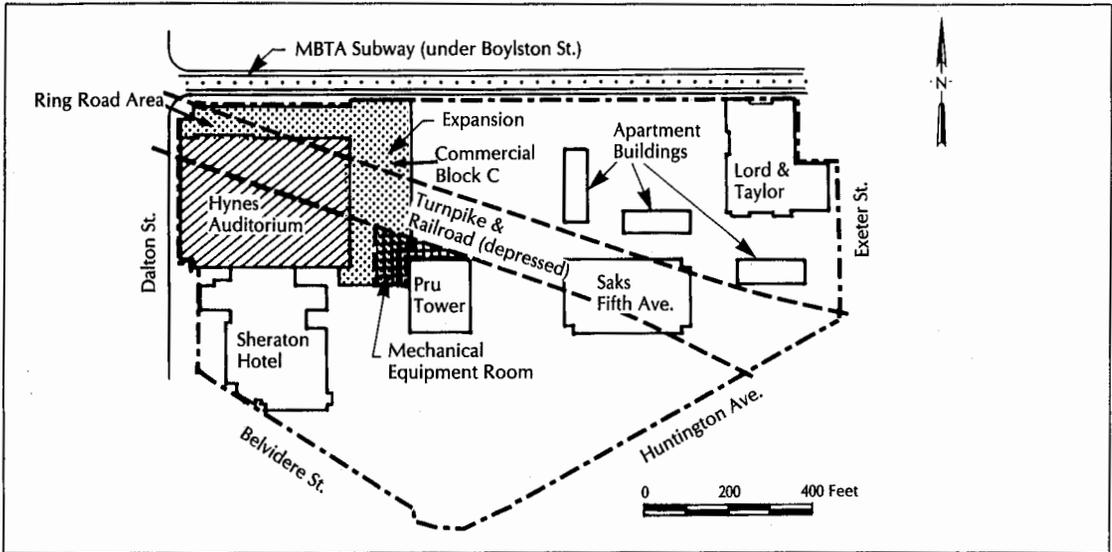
Plan location of the Hynes Auditorium within the Prudential Center Complex.
